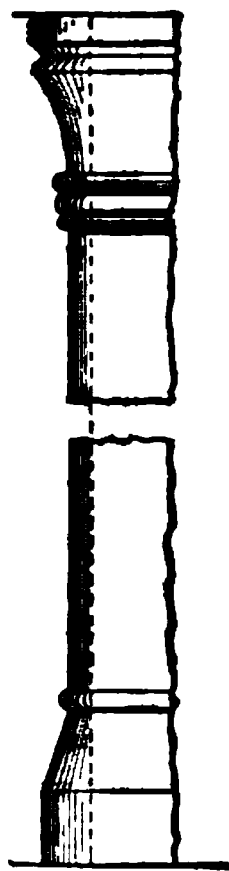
Cast-iron Column with Cap and Base. Slight Projections
